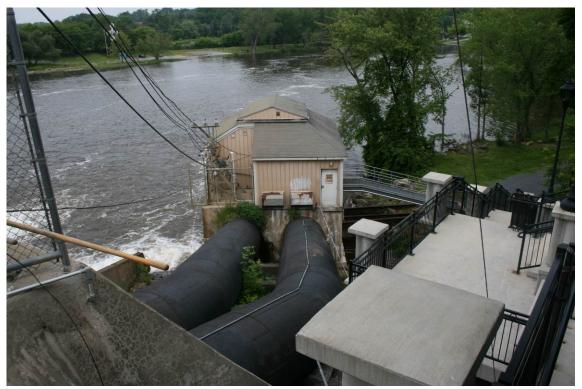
Penstocks and 9b powerhouse located on the north shore; view of the public park on the opposite shore.
